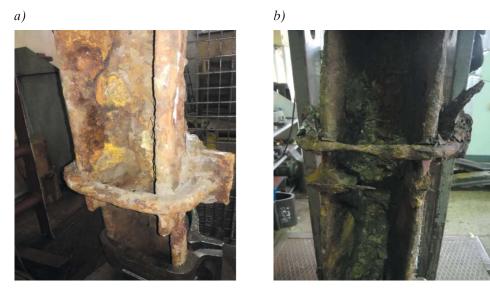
Bow bolts in joints during testing: a) no. 1; b) no. 2
